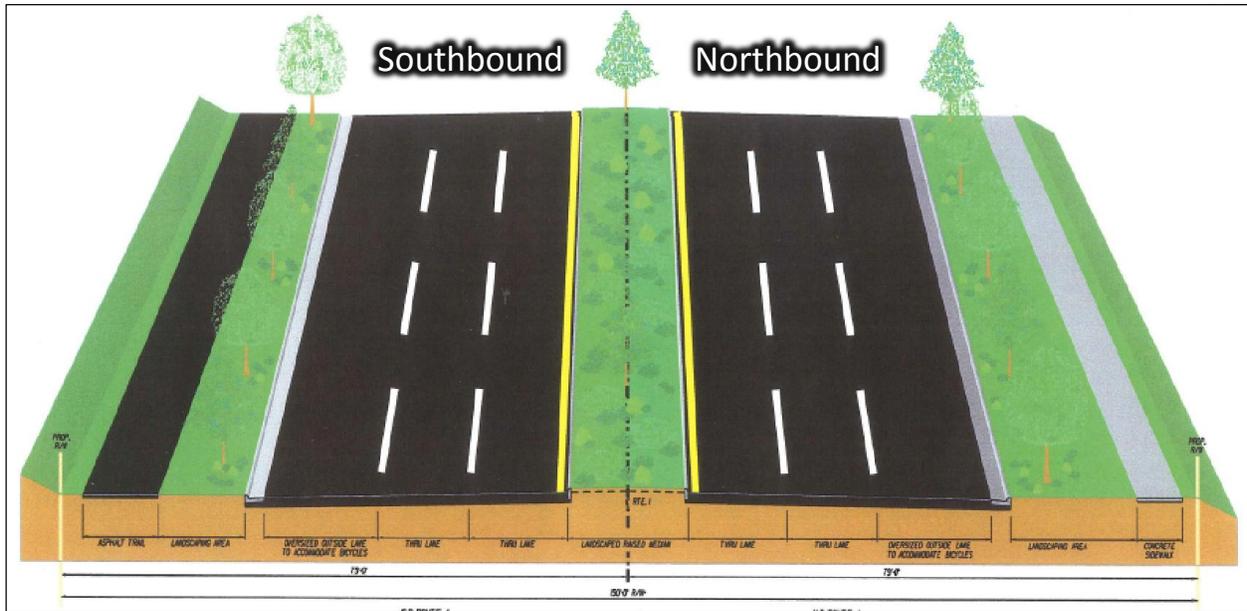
The approved cross section for this section of Richmond Highway's widening shows six lanes with pedestrian zones and a central median (Source: Virginia Department of Transportation)
